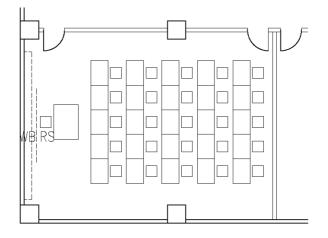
Laboratory A (Professional & Development Laboratory) Floor Plan
